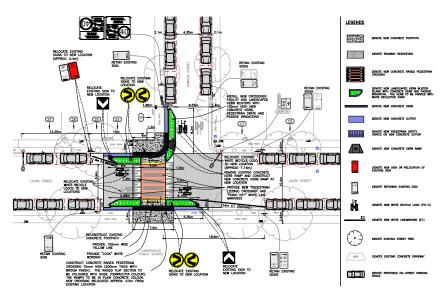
Laura Street between Edgeware Road and Hawken Street
